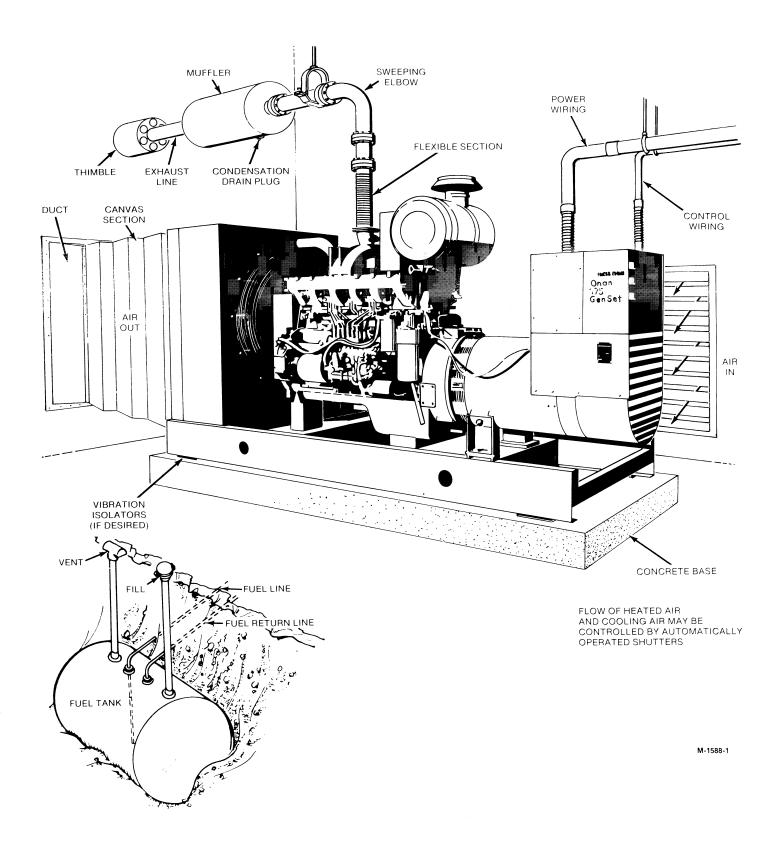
TYPICAL DV GENERATOR SET INSTALLATIONS
